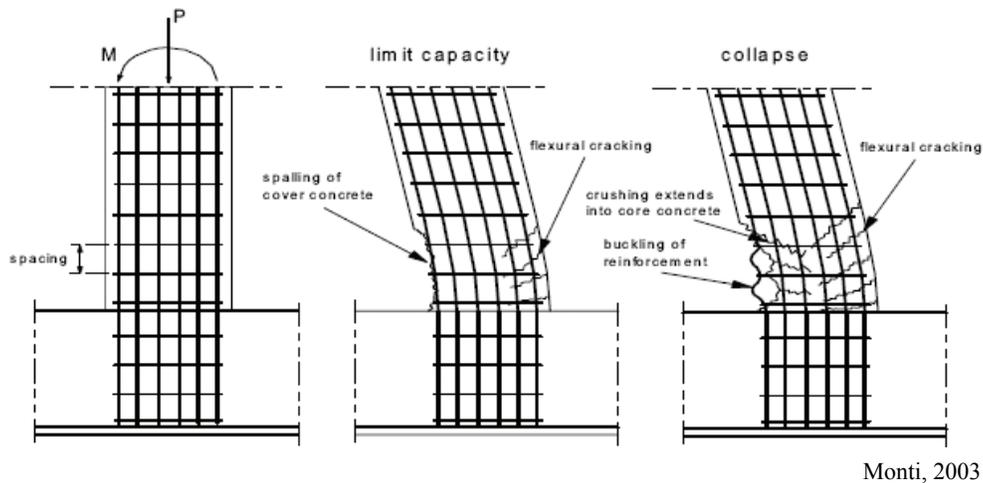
Lateral Collapse Mechanism of an Under-designed Column without FRP Jacketing
